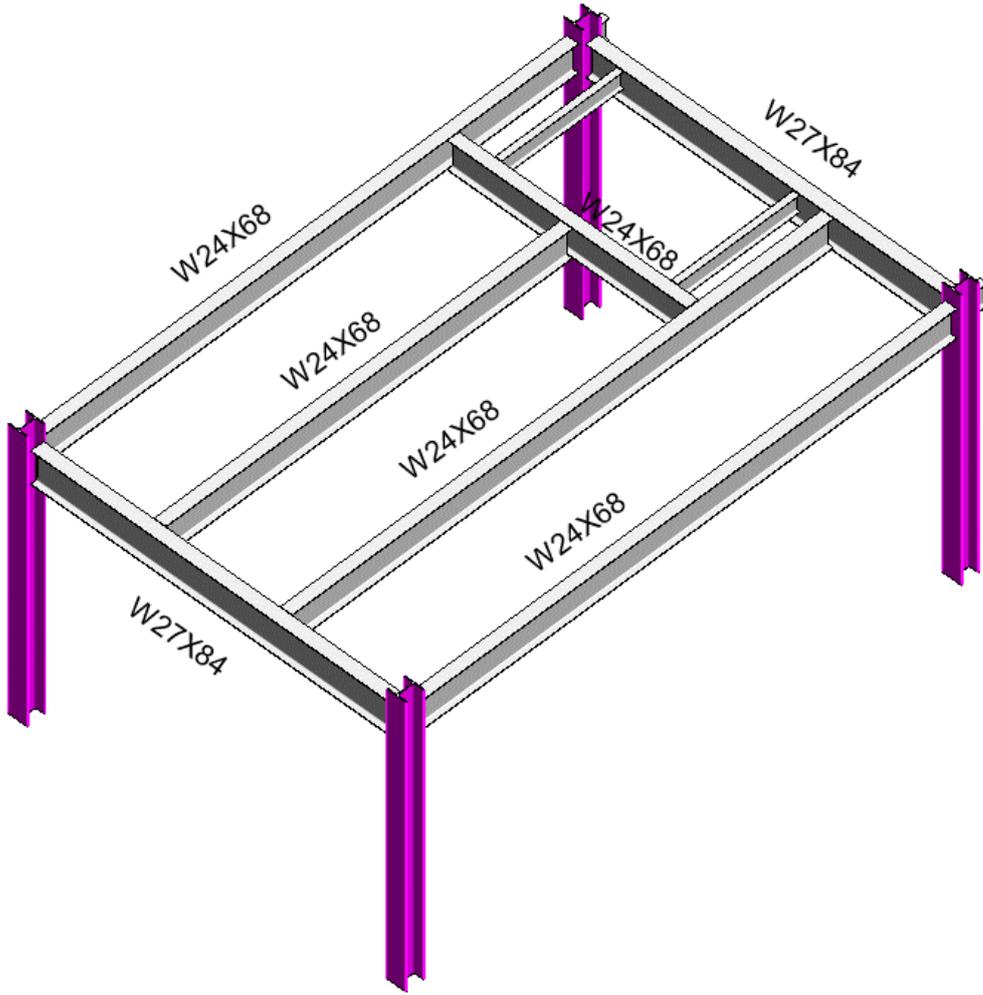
Framing Configuration Isometric View – 95% Design Drawings
